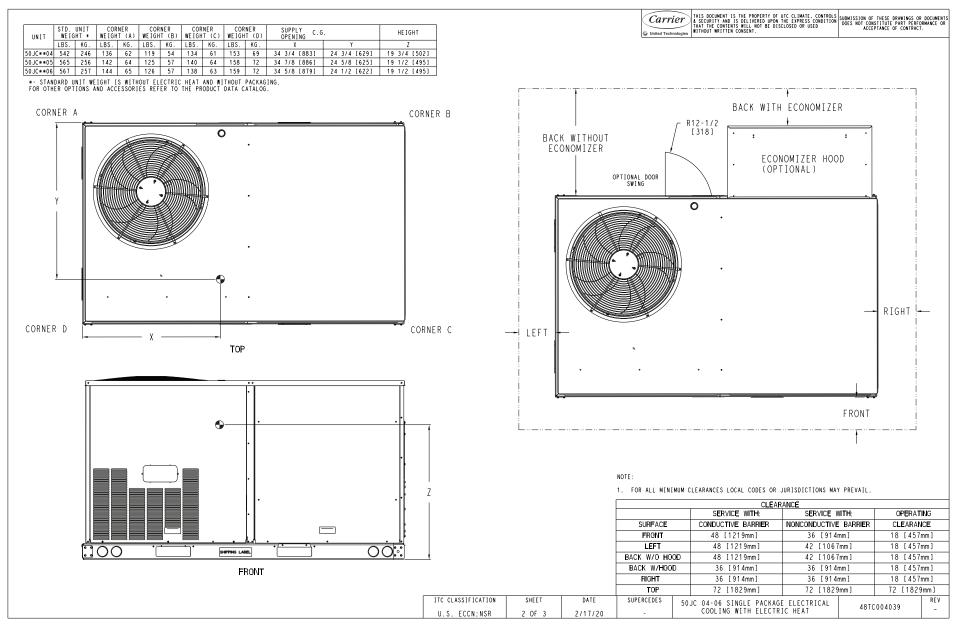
50JC 04-06 Unit Dimensional Drawing
